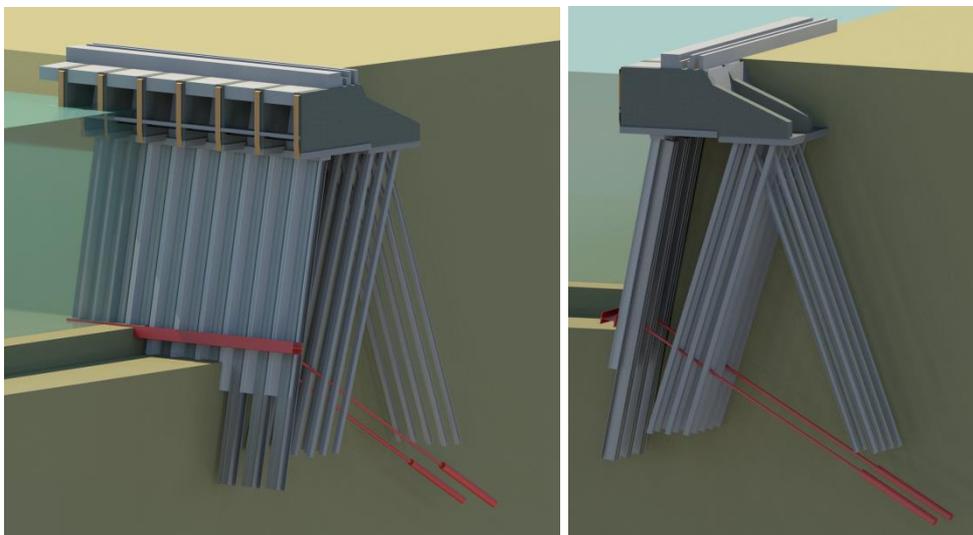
visualisation of the additional underwater anchorage (red) in the existing quay wall
